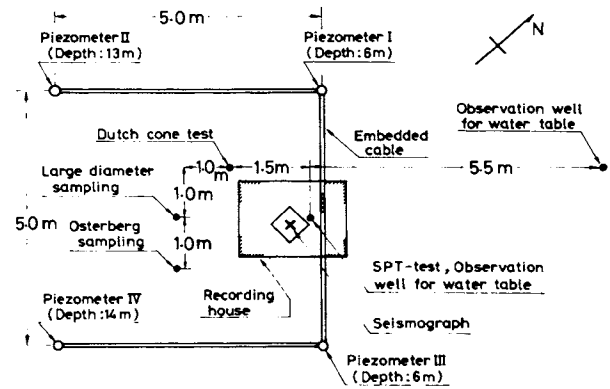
Layout of positions of instruments and in-situ sampling and sounding tests
